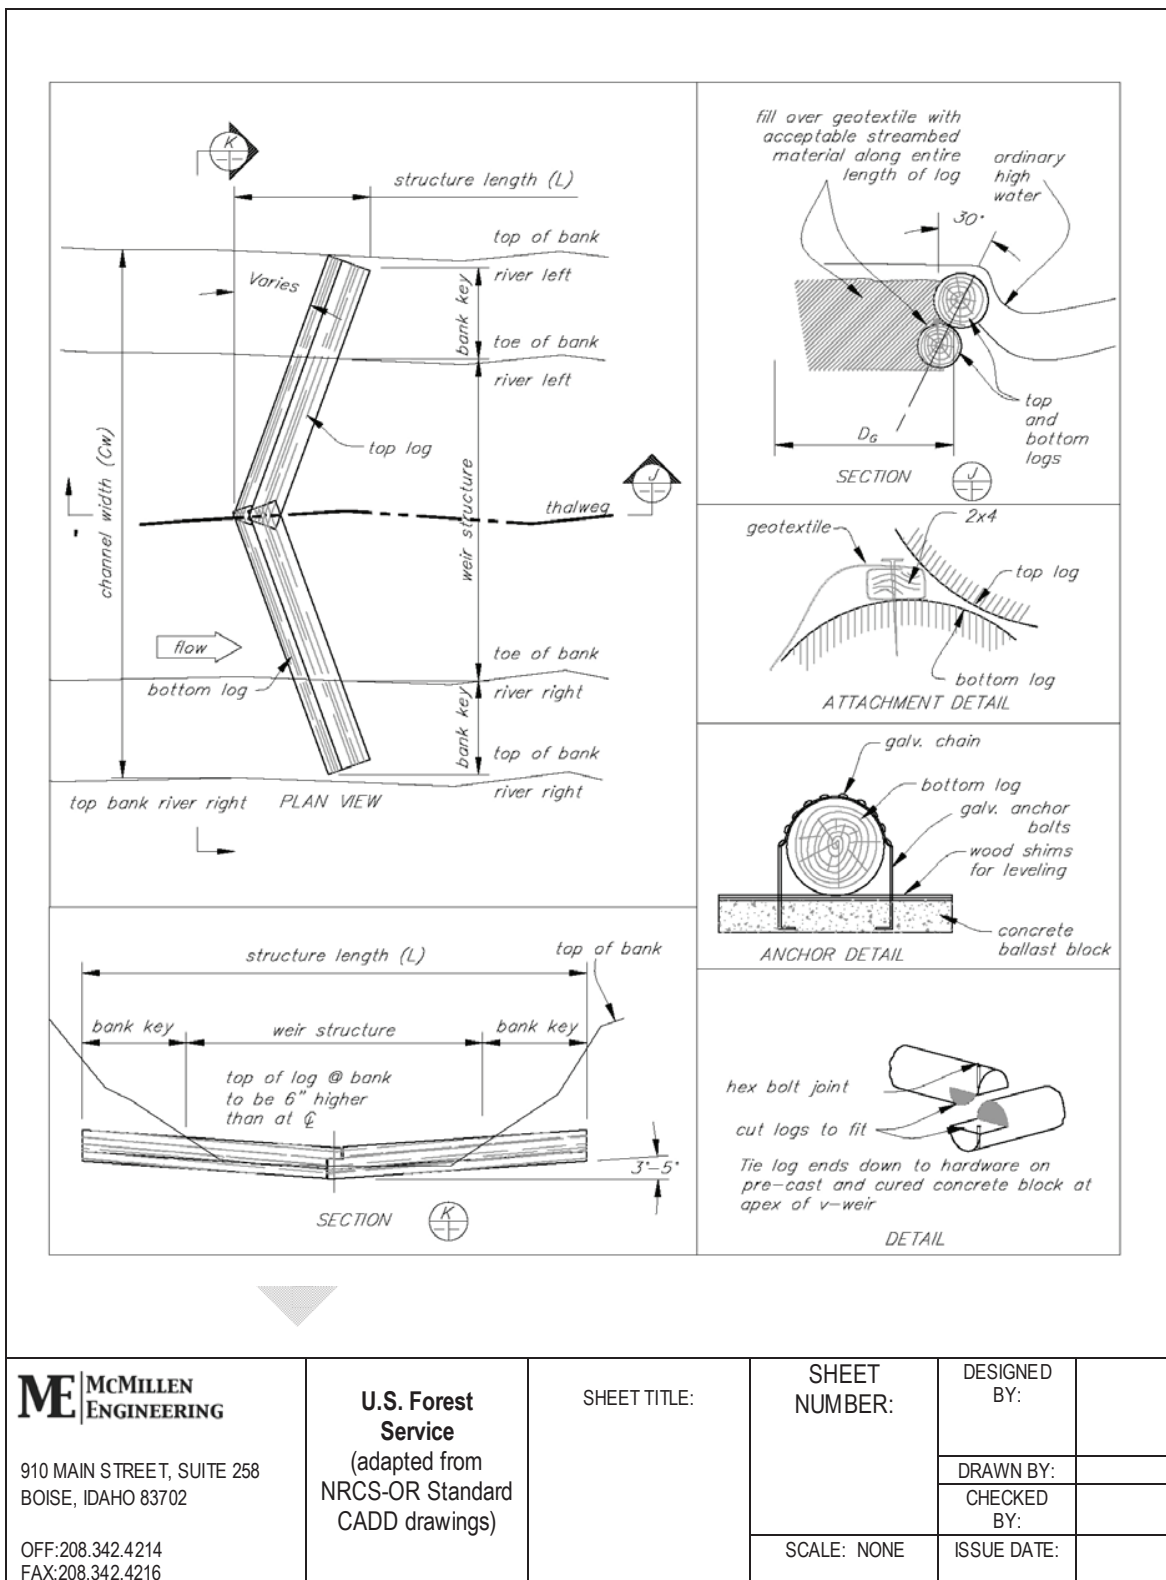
Plan and section views and details for a permanent log weir. Adapted from Oregon NRCS standard AutoCAD drawings.
